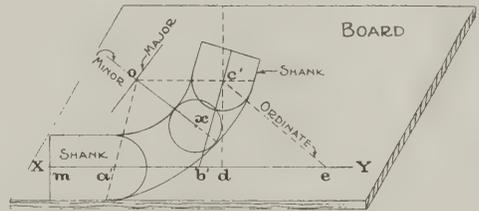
Showing How to Draw the Face Mold Over Plan, Fig. 6
